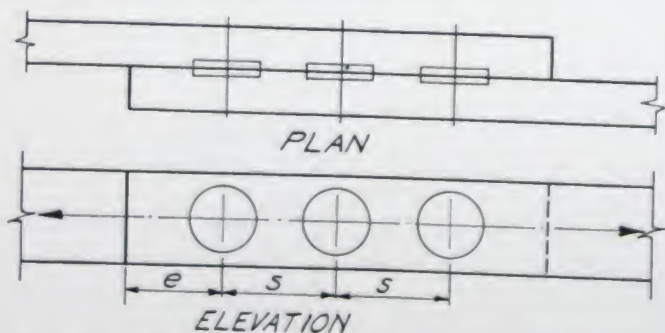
Two-Member Tension Joint, Loaded Parallel to Grain
